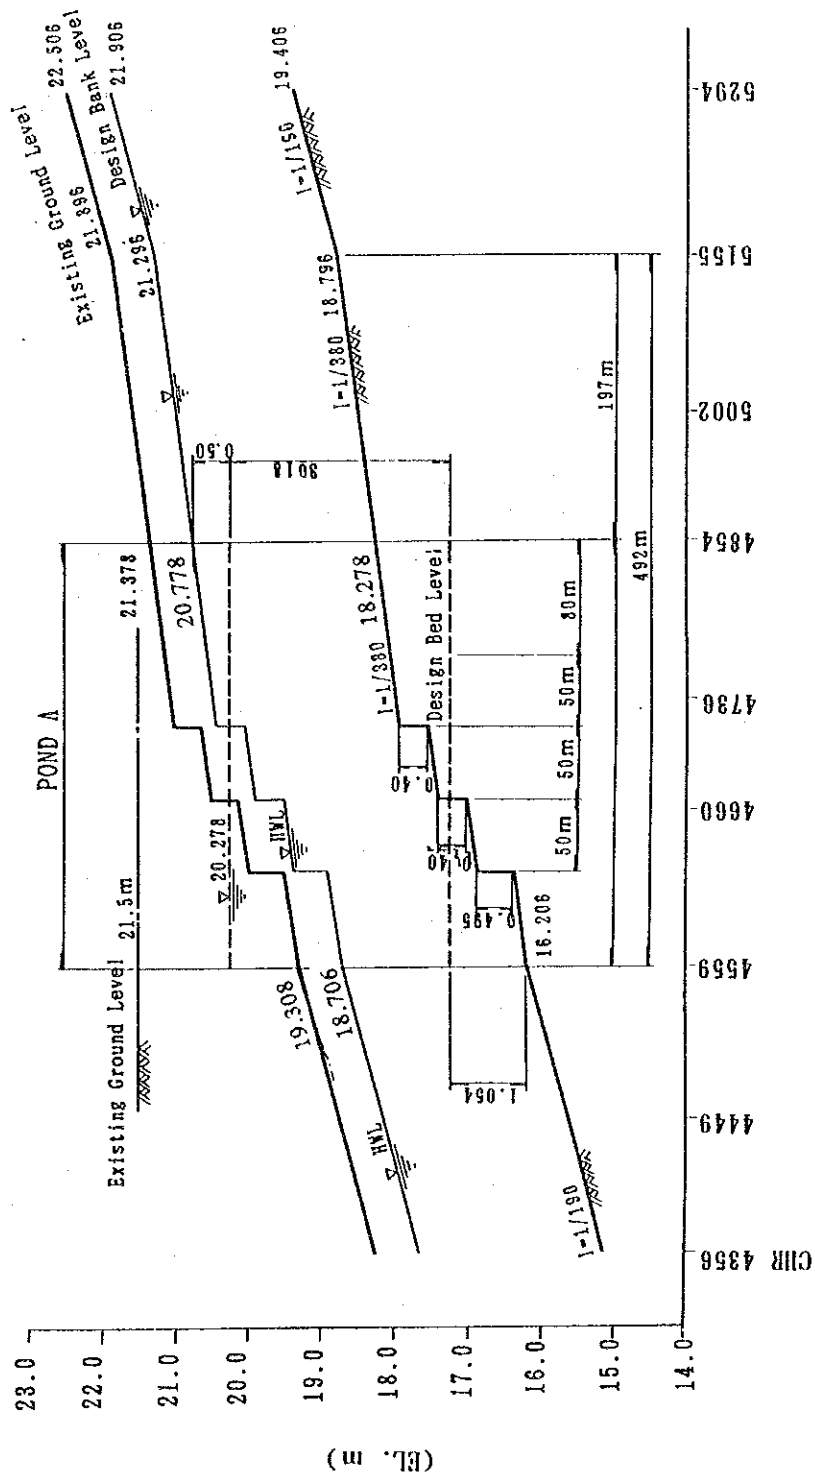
LONGITUDINAL PROFILE OF PROPOSED RETENTION POND A
